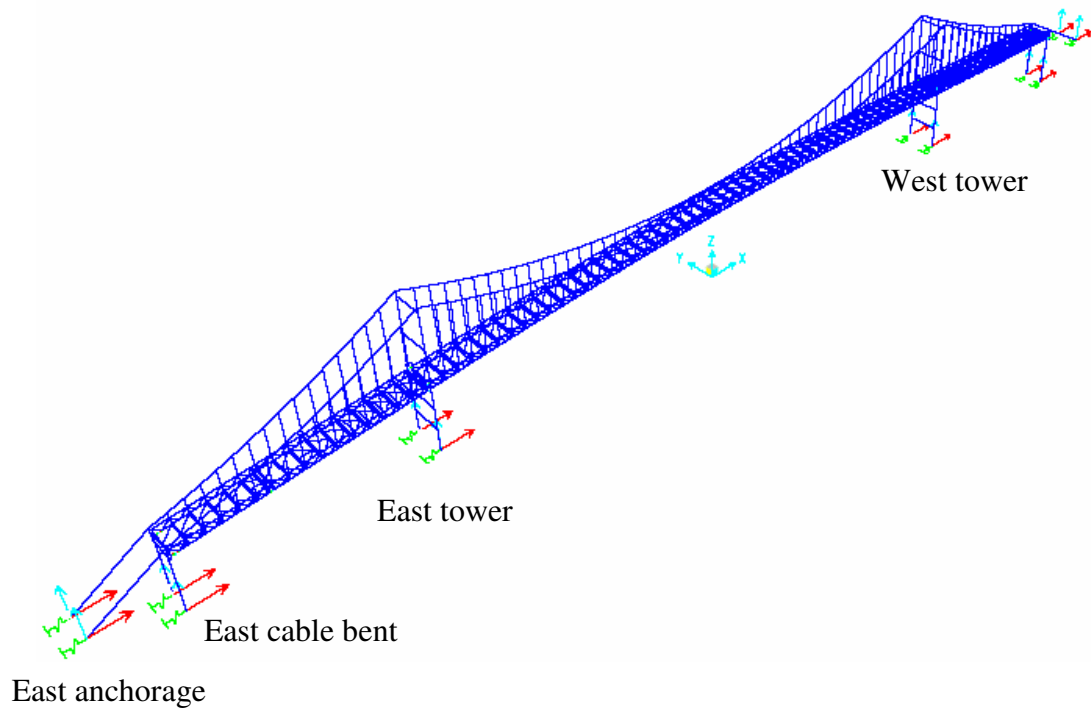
Detailed model in SAP 2000 with foundation springs
